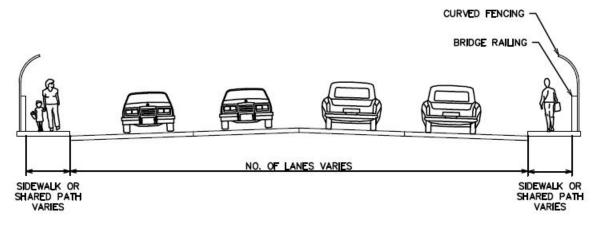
Typical Section of Curved Fencing Added to Existing Crossing
